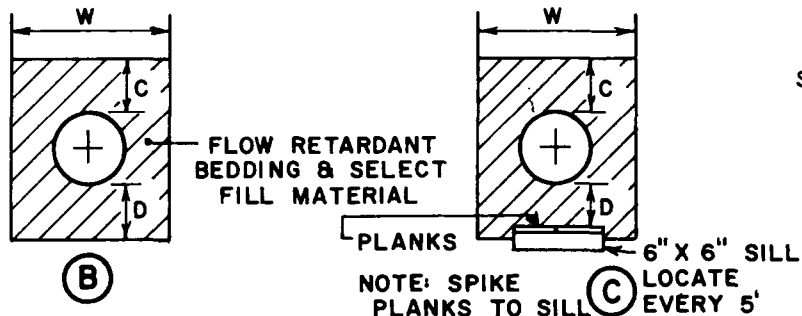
presents a typical sewer construction detail for the Gulf Coast area.
